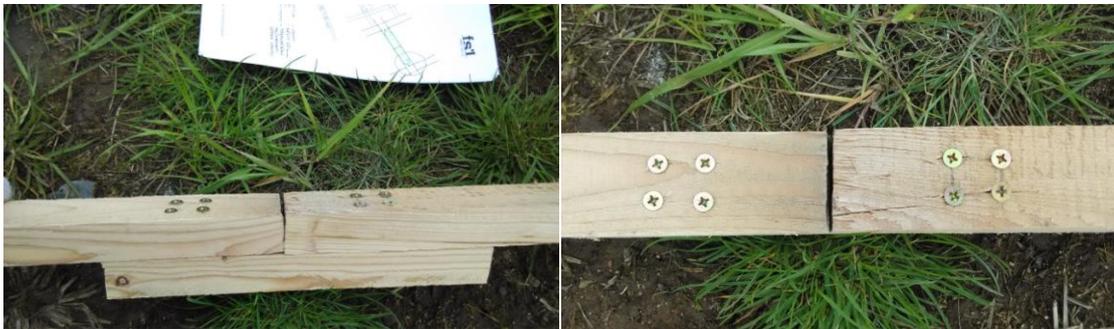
Testing sample - Longitudinal connection of two larch timber laths [photo by author 3/2016]
